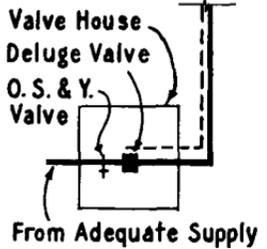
Typical deluge fire protection arrangement for cross-flow towers.
